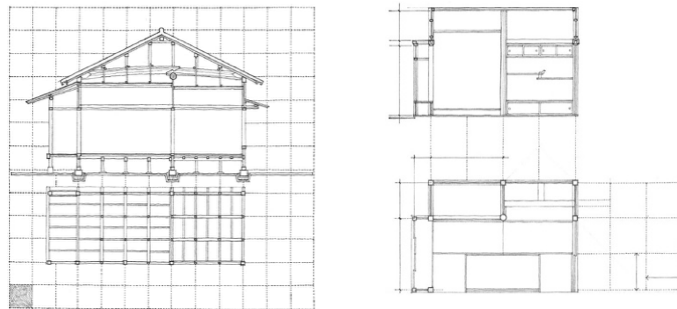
Ken, Traditional Japanese House, Elevation & Plan, P.303 (Ching, 2014)
